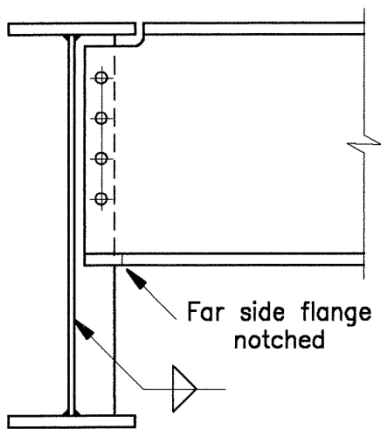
to Figure 10.49, on the following pages, shows further examples of drawings of various end connections for beams.
